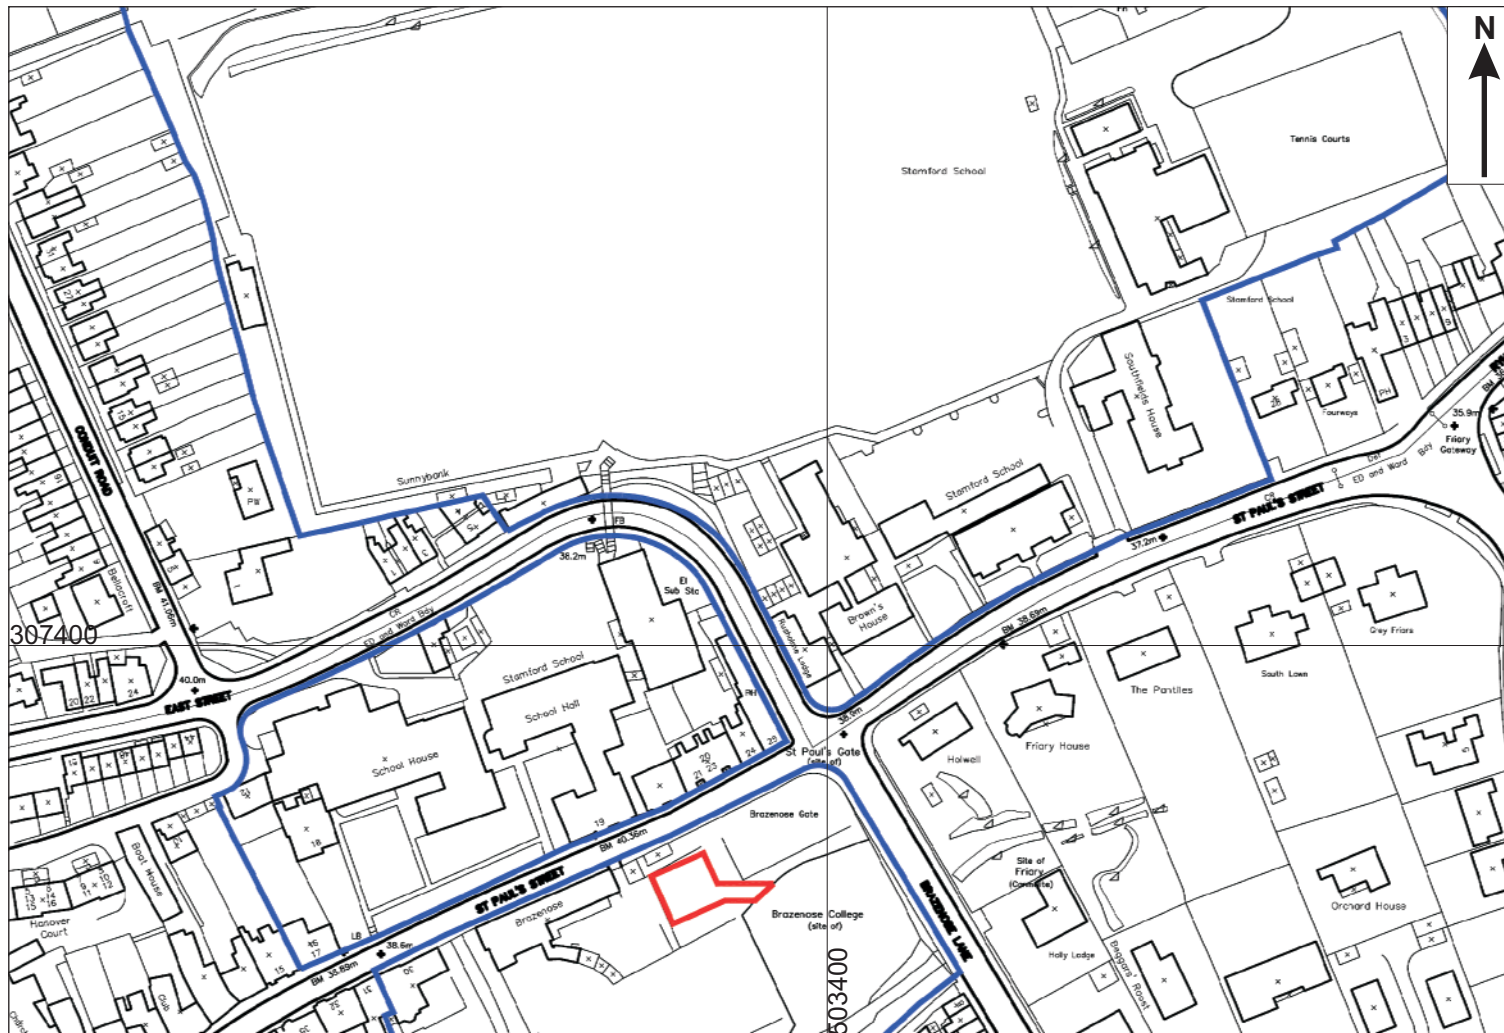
Site location plan at scale 1:2000 with the new car park outlined in red
